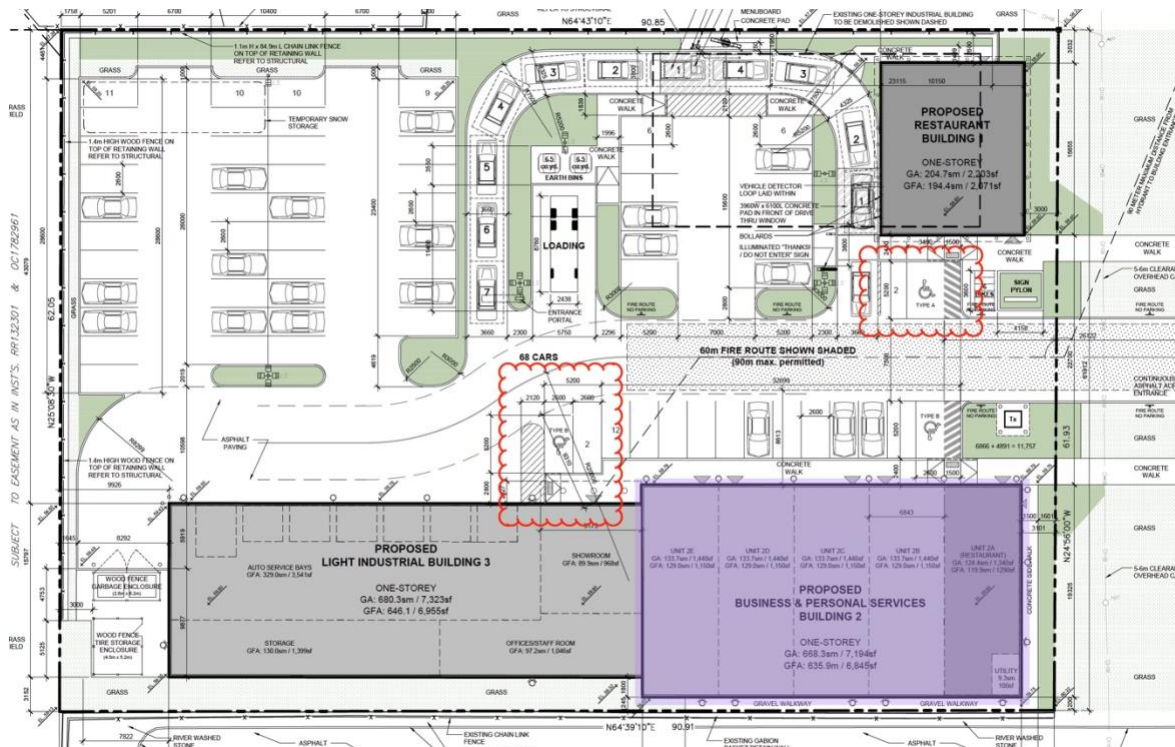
Extract of Site Plan (Source: McRobie Architects & Interior Designers), marked up by Q9 Planning + Design. Building 2 is highlighted on the plan in purple
